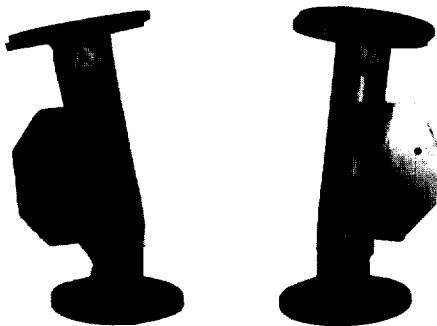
Typical Failure Mode of Tube-Gusset Connections
